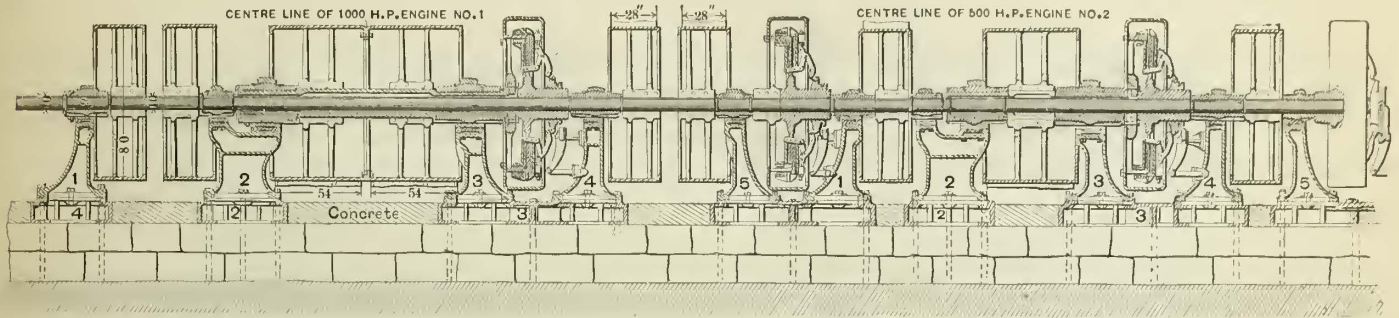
SECTION OF SHAFTING—CAMBRIDGE POWER STATION, WEST END STREET RAILWAY.
